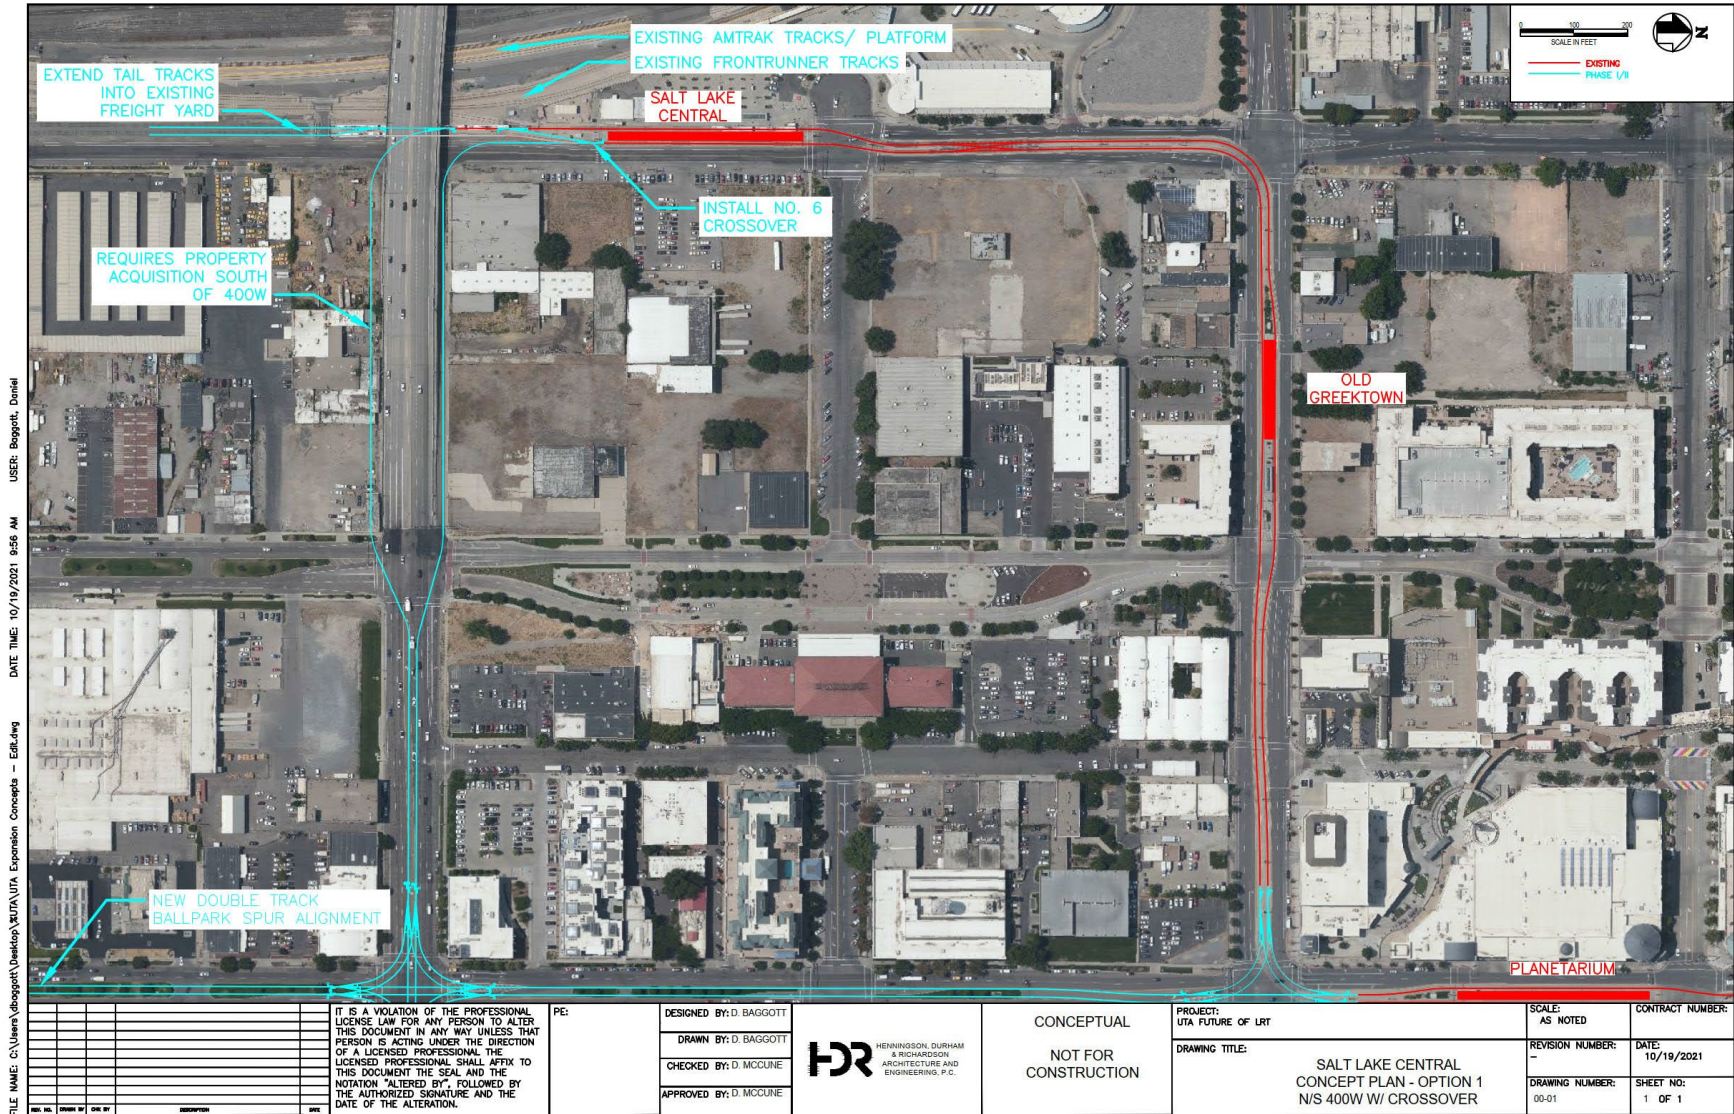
Revised Connection from Ballpark Spur to Salt Lake Central via 400 South/600 West
